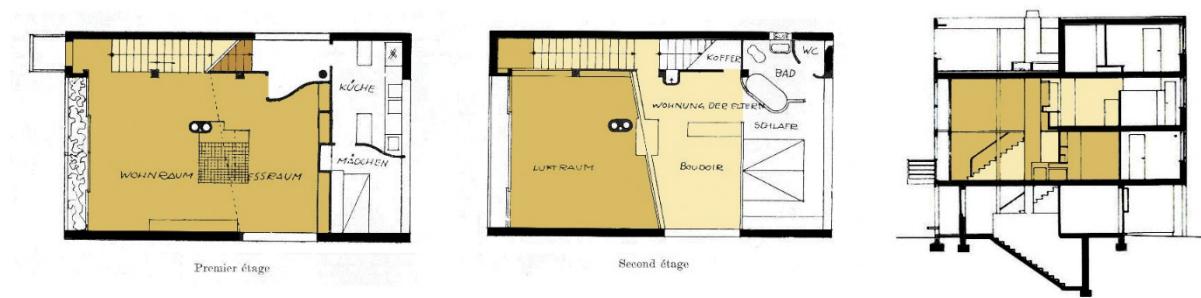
Maison Citrohan V – Floor plans and section © Towards New Architecture
